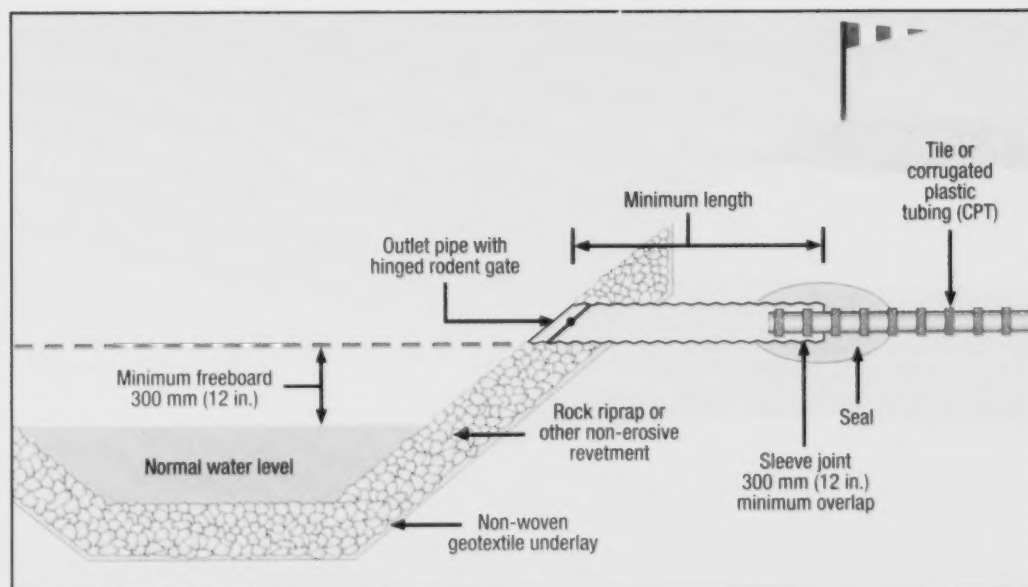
Well Constructed Tile Drain "Flush Type" Outfall
